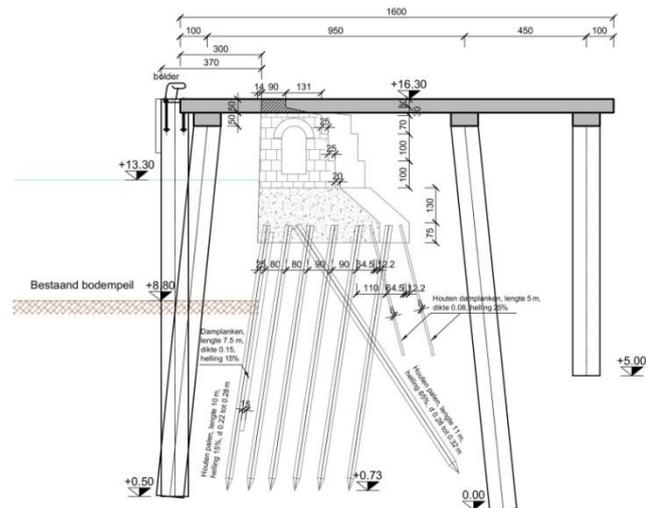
Vergote Dock – reinforced quay wall – loading/unloading area – 40 kN/m² mobile load – reduced platform 25m x 16m (source: Technum)
